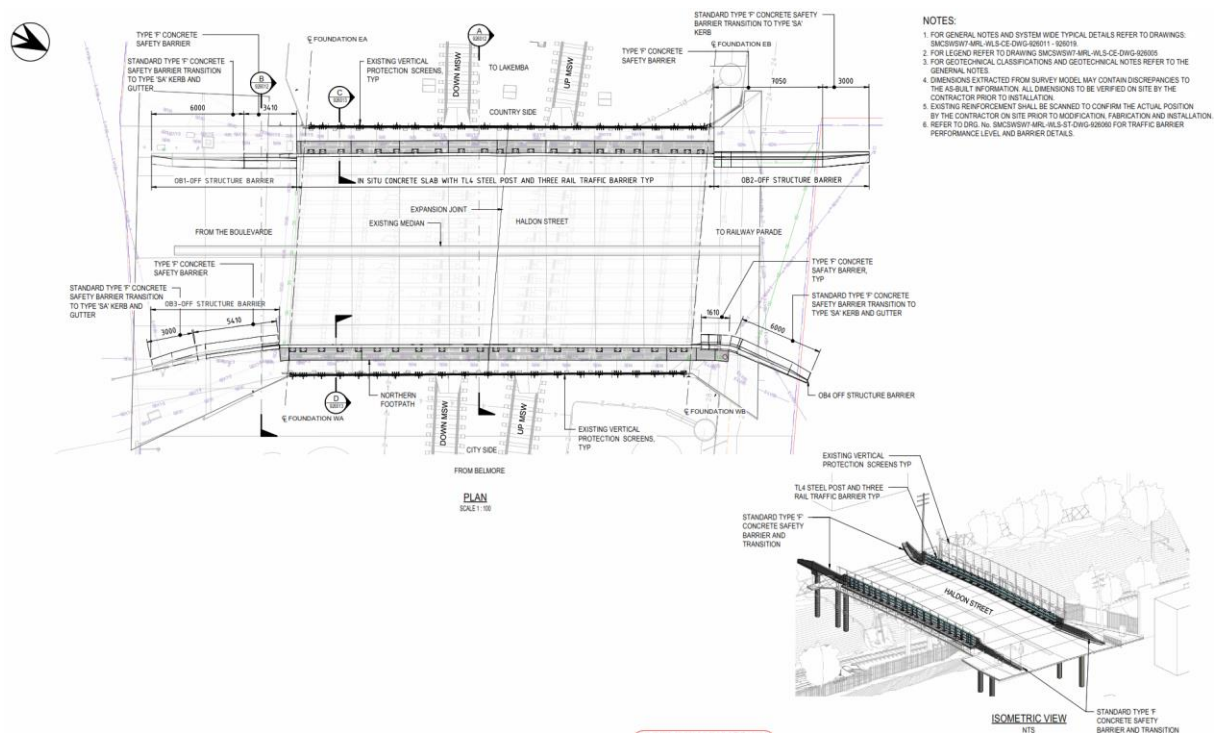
Plan of treatment works for Haldon Street Bridge (Source: Metron T2M 2022, provided by ARCH Artifex)
